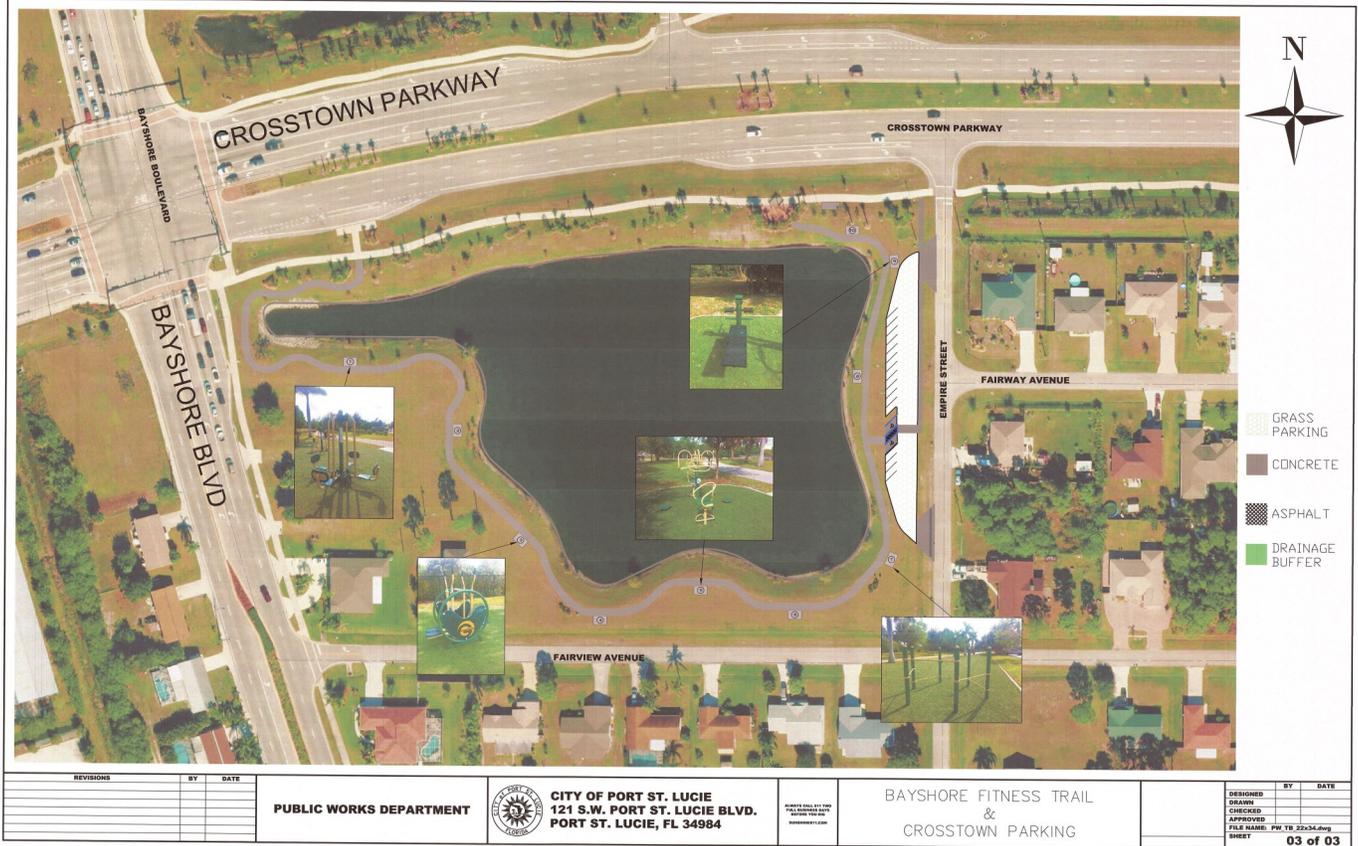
Crosstown Parking Lot to access the Crosstown Trail
